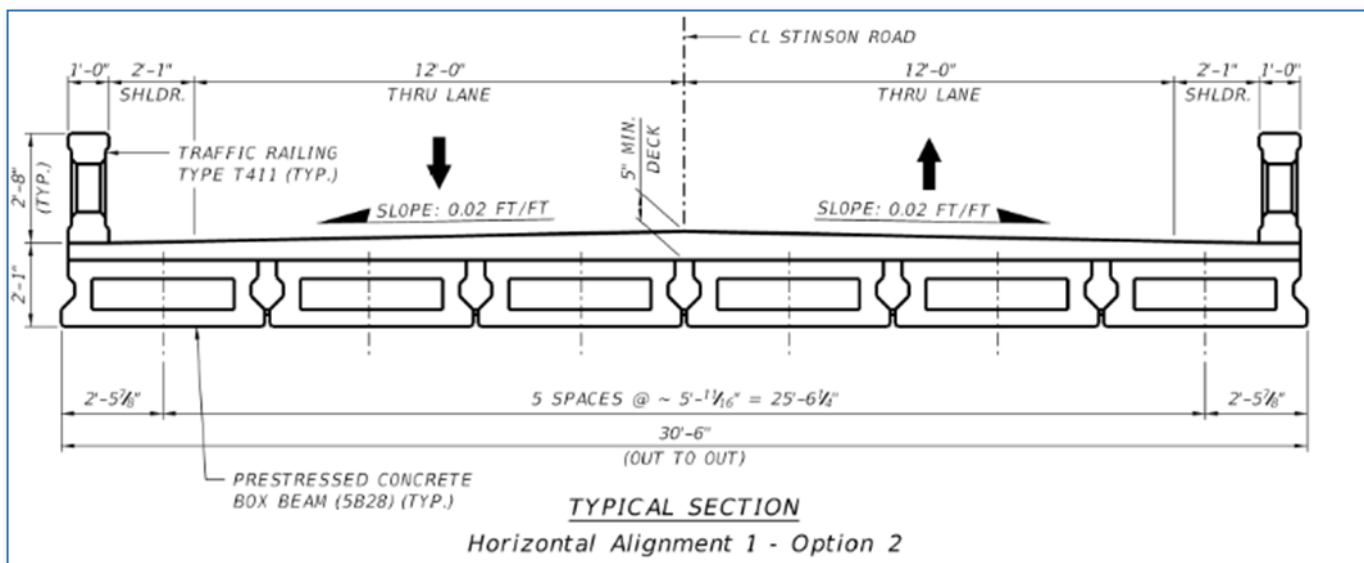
TxDOT Prestressed Concrete Box Beams (5B20) Typical Section
